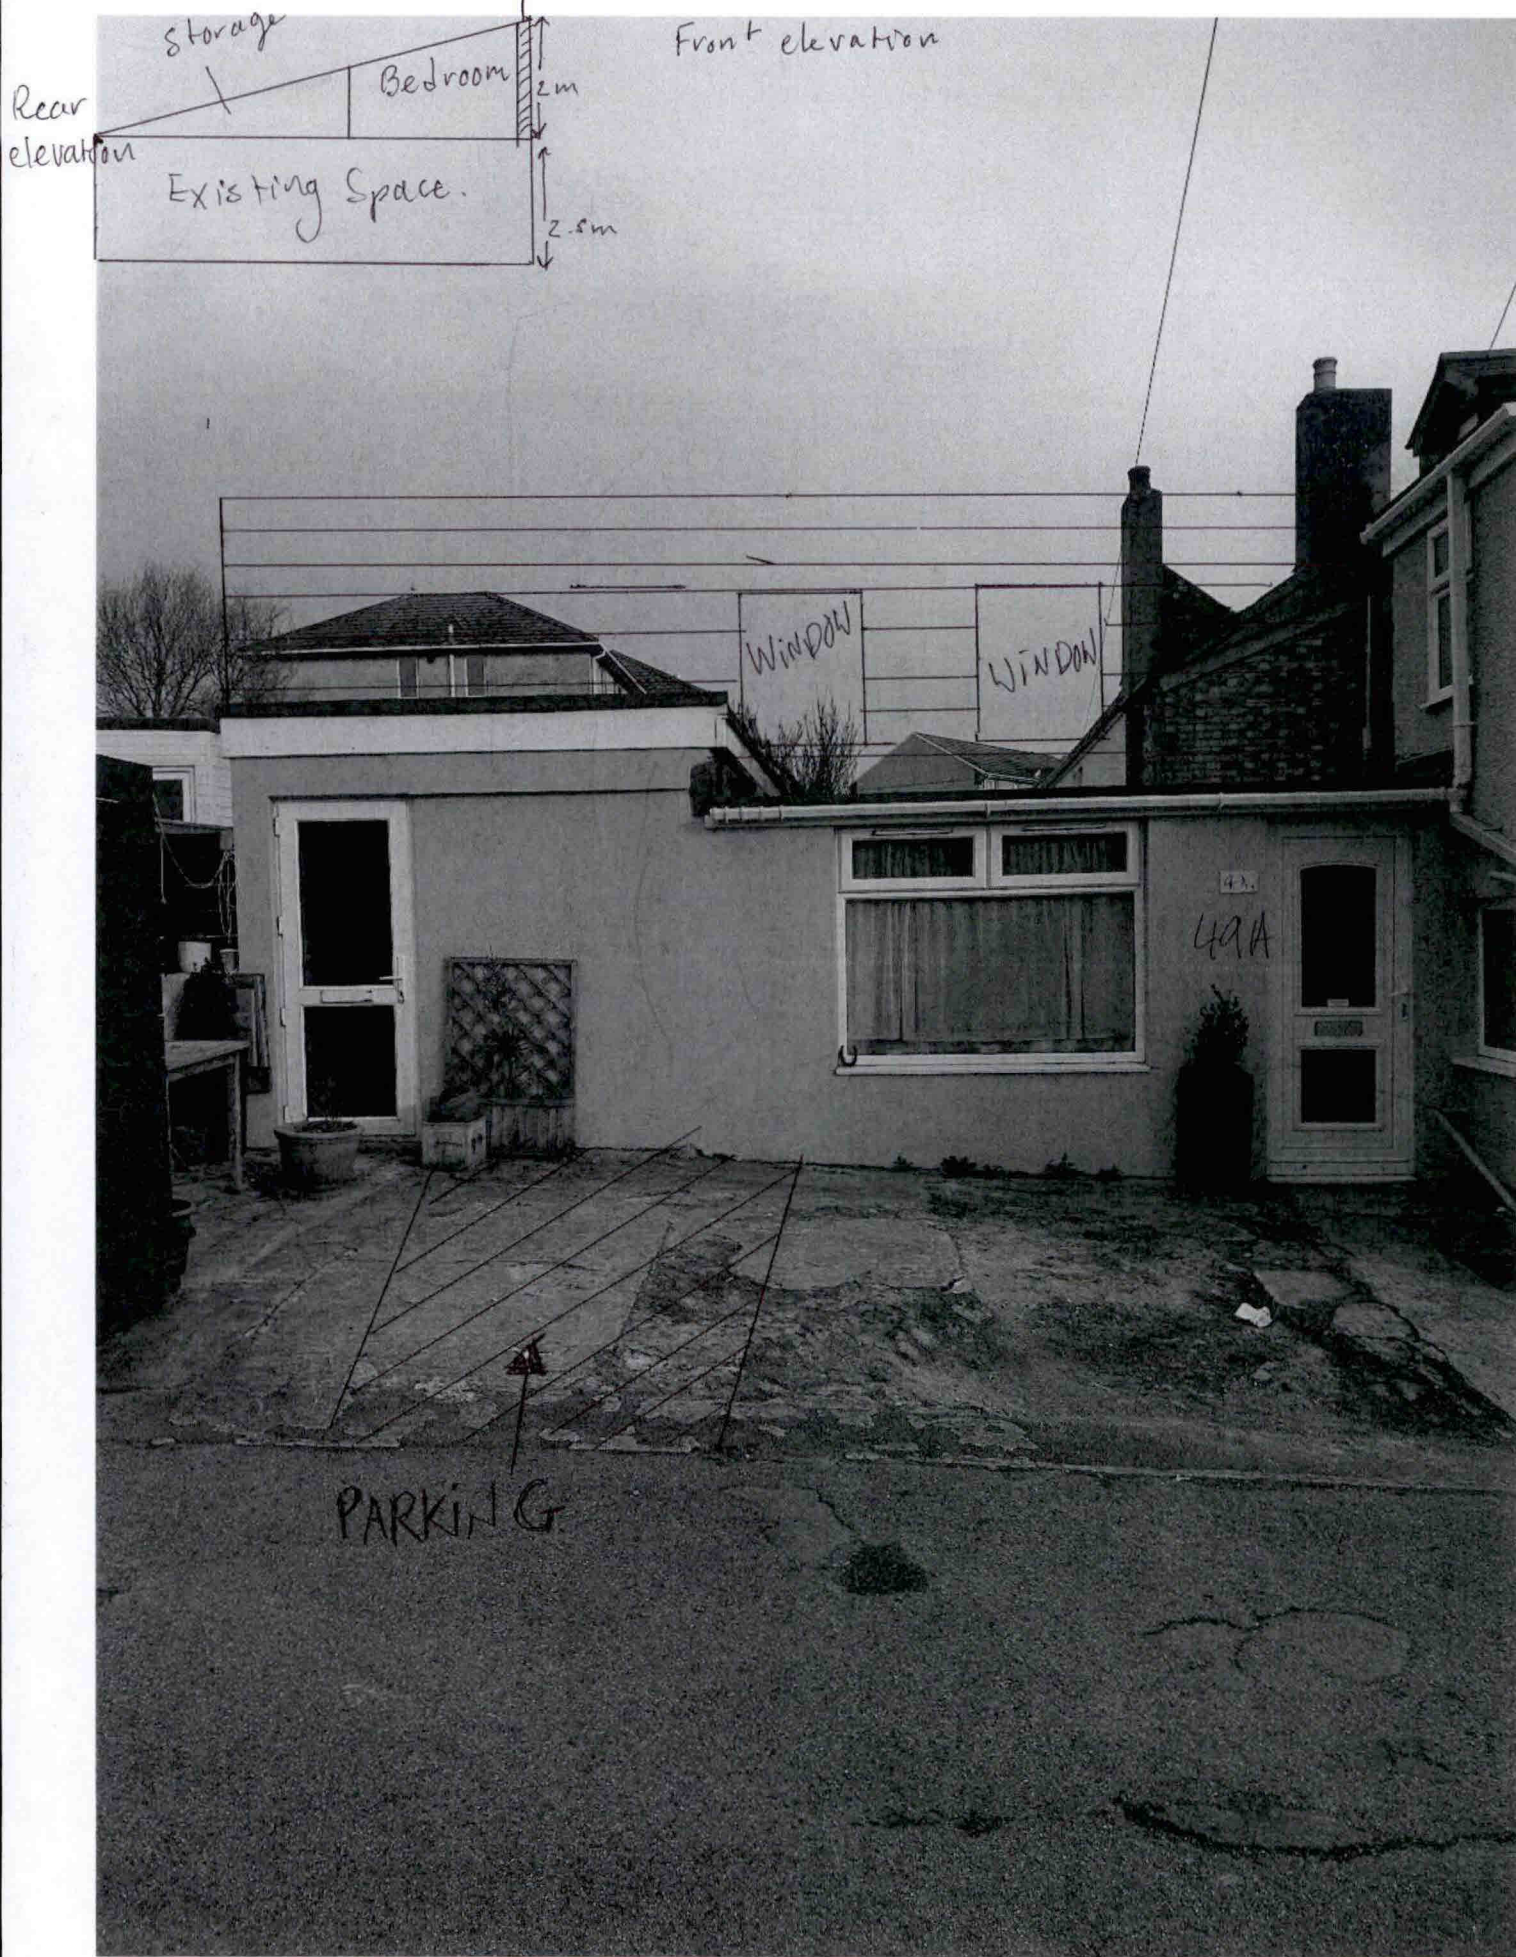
Shows alternative style roof which is 2m @ front elevation, tapering to 0m at rear elevation.
